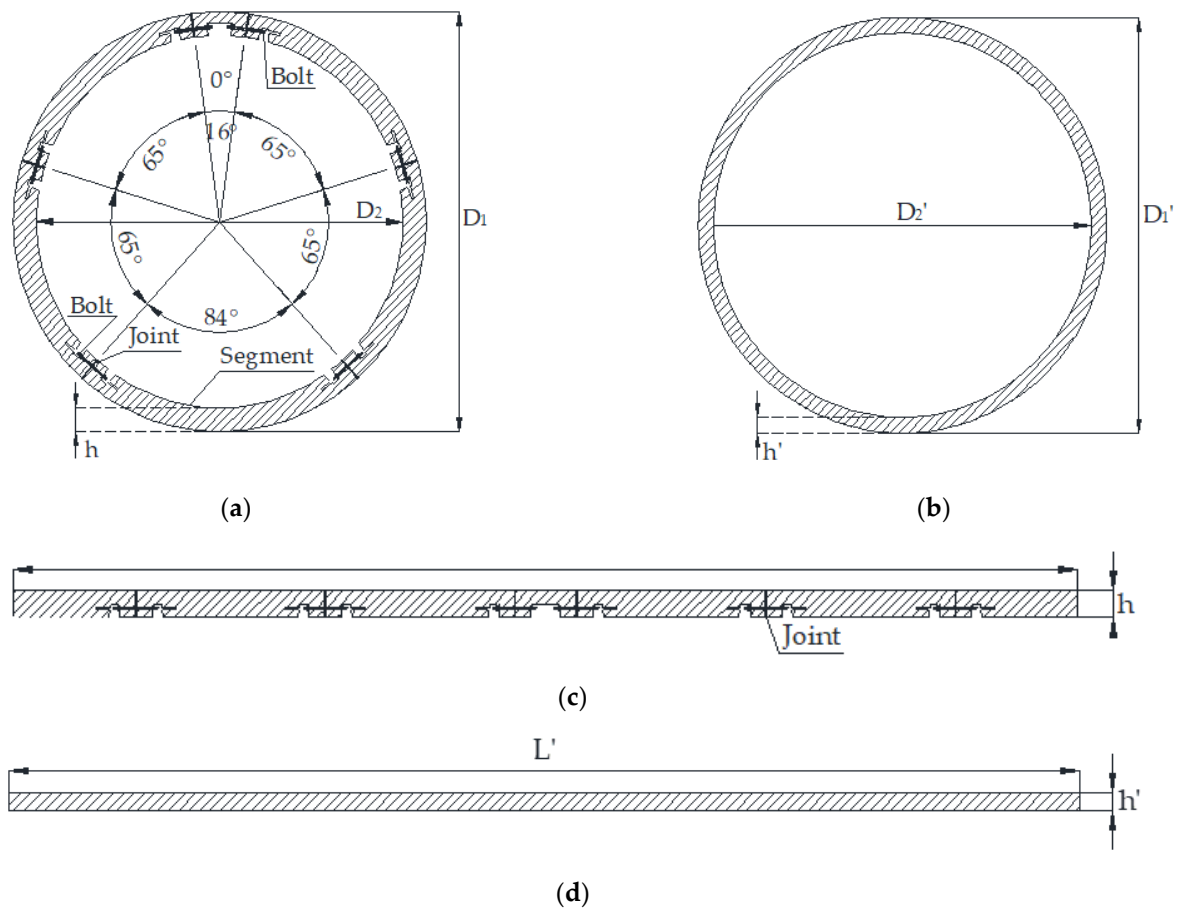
Straight beams spread from the installed segment ring and the modified uniform rigidity ring: (a) Installed segment ring; (b) modified uniform rigidity ring; (c) straight beam spread from the installed segment ring; (d) straight beam spread from the modified uniform rigidity ring.
